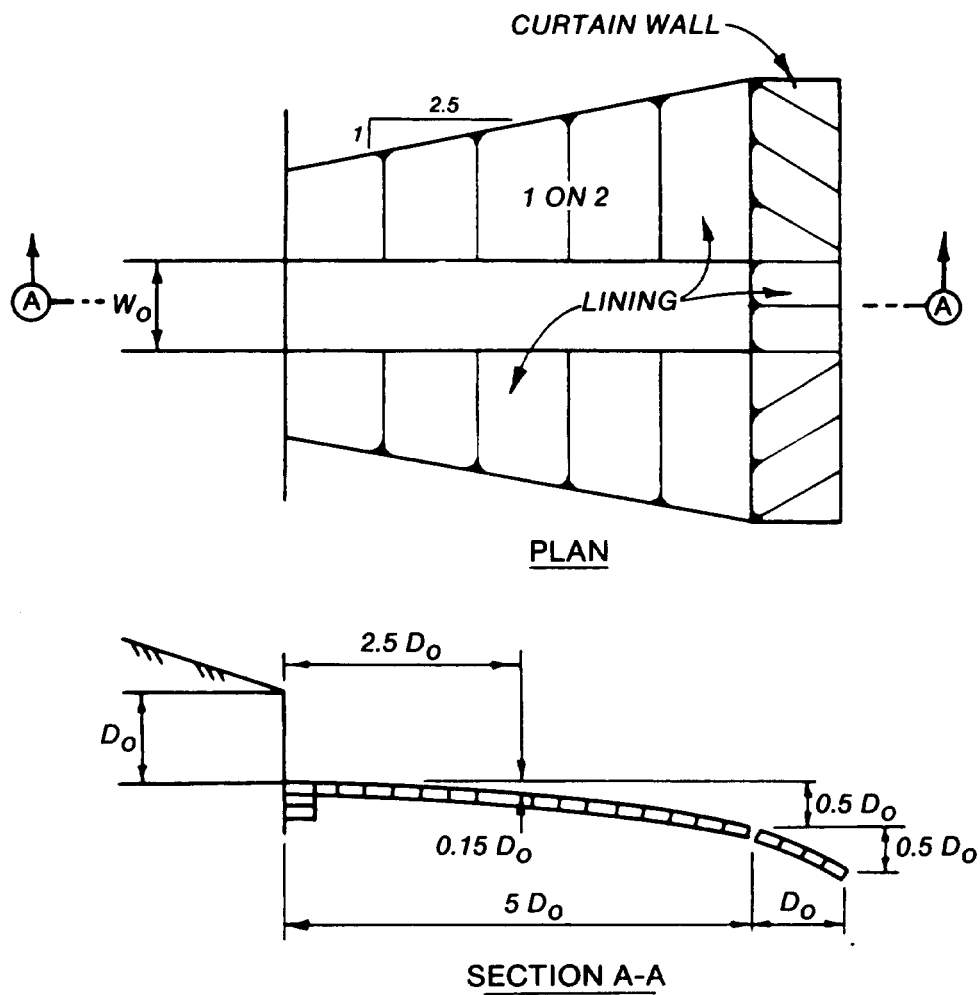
Culvert outlet erosion protection, lined channel expansions.
